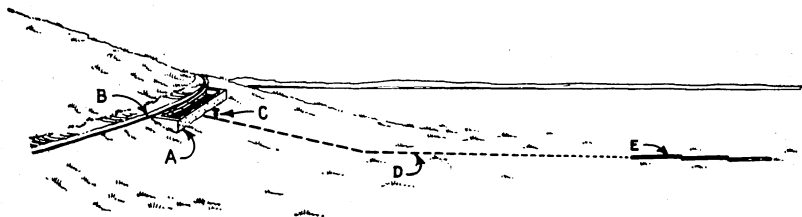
Range-water supply for sheep: A, Concrete storage tank built into slope of watershed; B, collection ditch diverting snow water run-off into storage tank; C, control valve; D, pipe line; E, trough.
